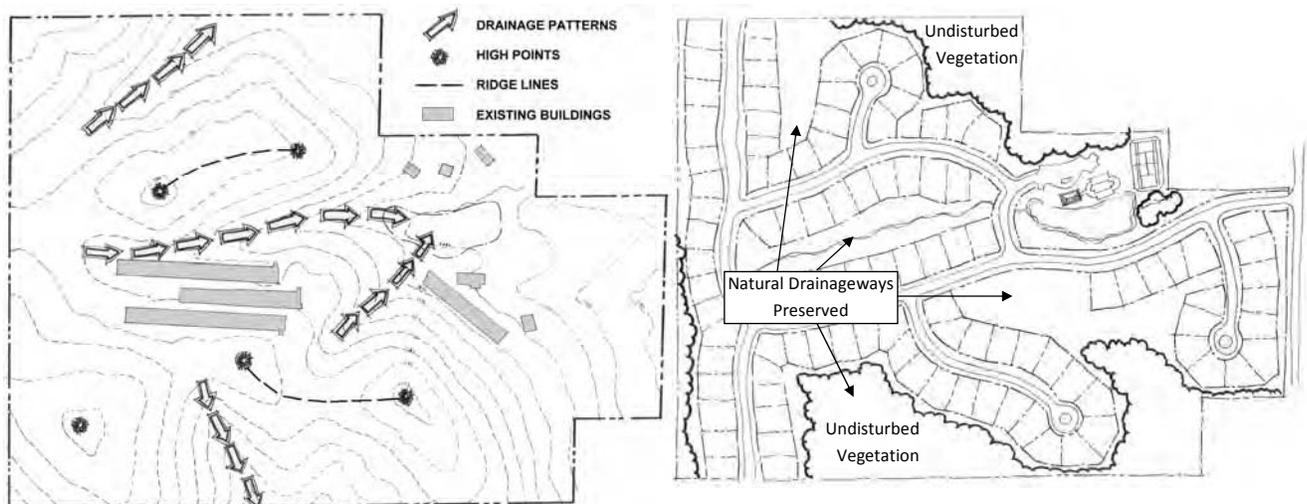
Example of a Subdivision Using Natural Drainageways for Storm Water Conveyance and Management
